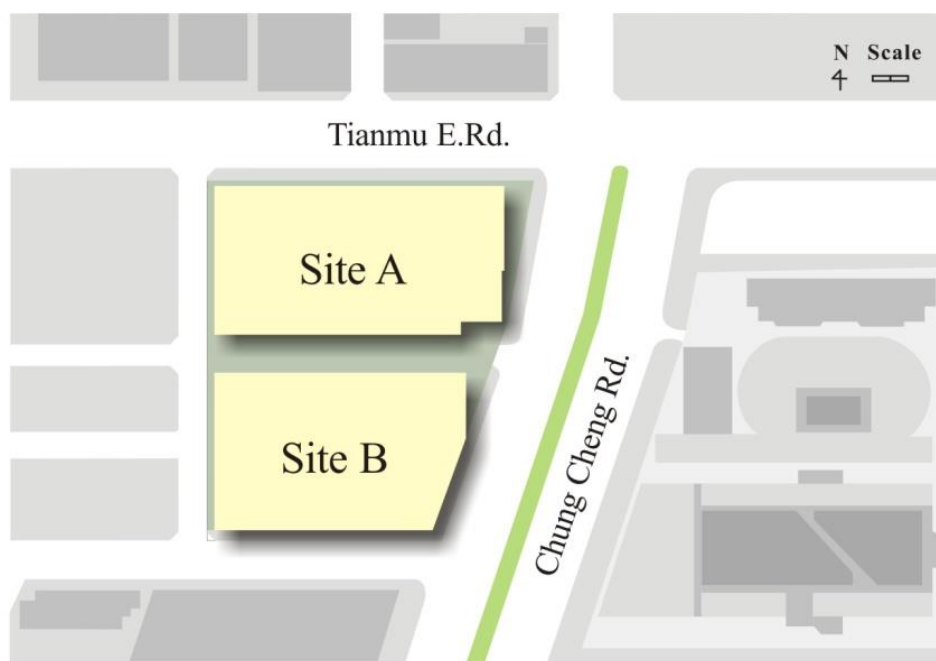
Plan view of base (Ou and Hsieh, 2004)
